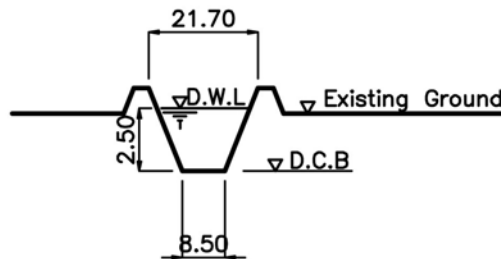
Typical Section of the Proposed Gelman Darreh Bridge
